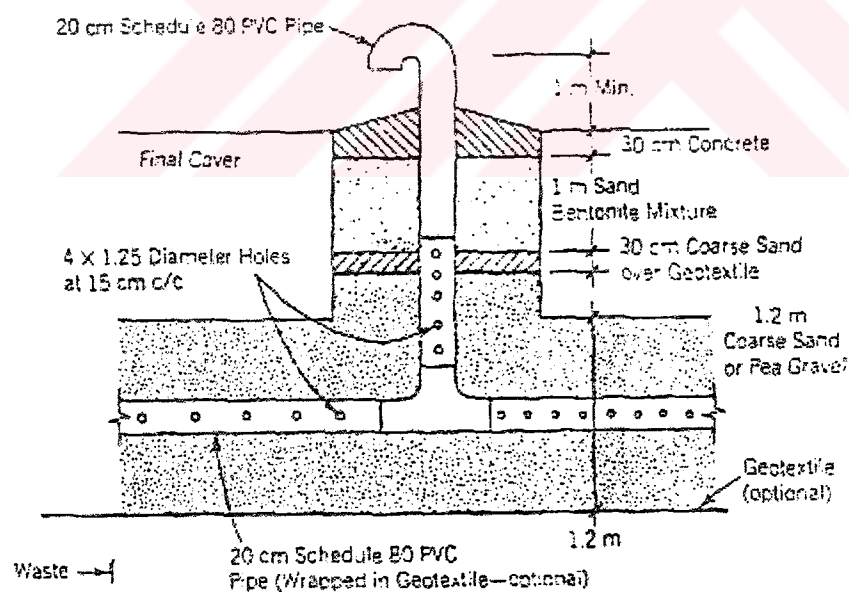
Typical detail of a passive gas venting system with a header pipe (Bagchi, 1989)
